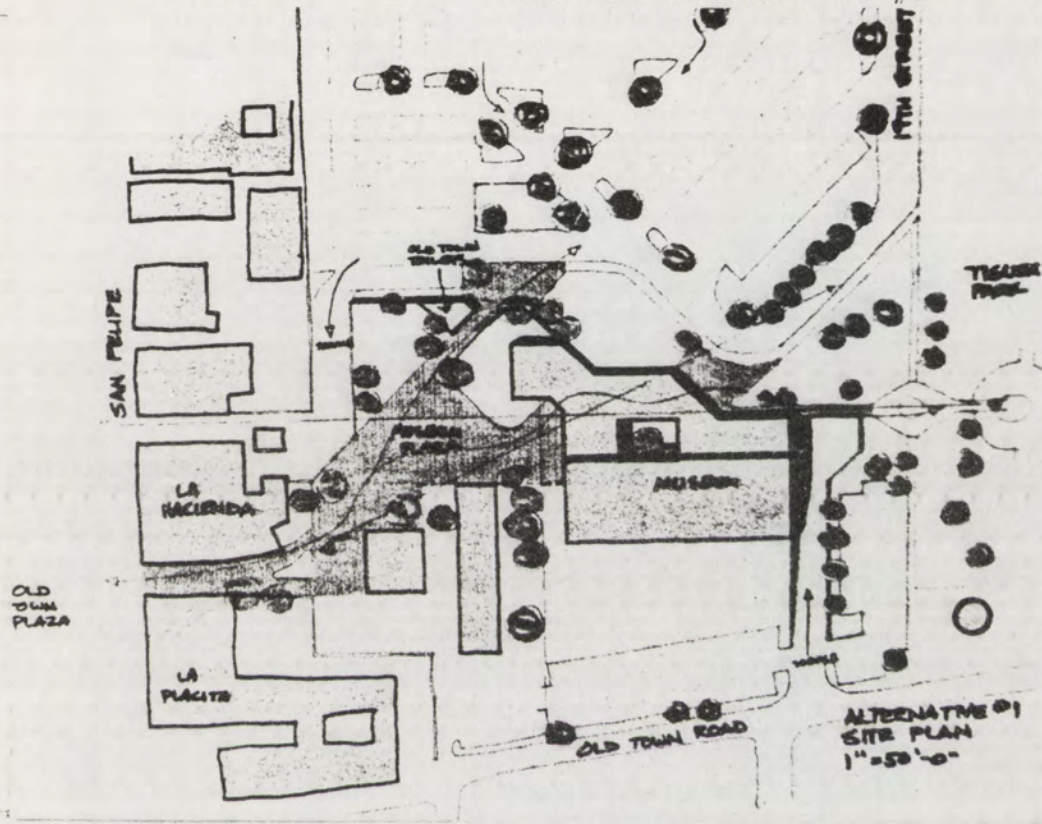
SECTION DESIGN PROPOSAL #1
